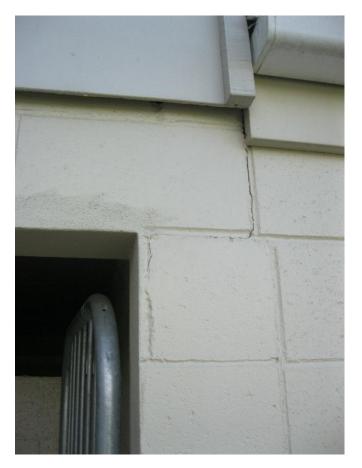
Toilet and gas storage portions of the eastern end of the building.
